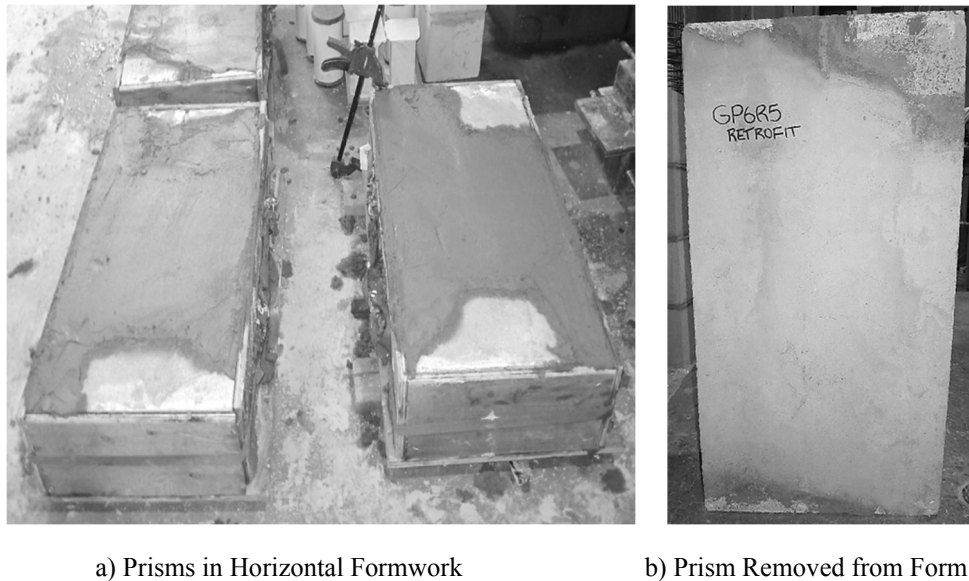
Retrofit Prisms Following Completion of Repair Grouting
